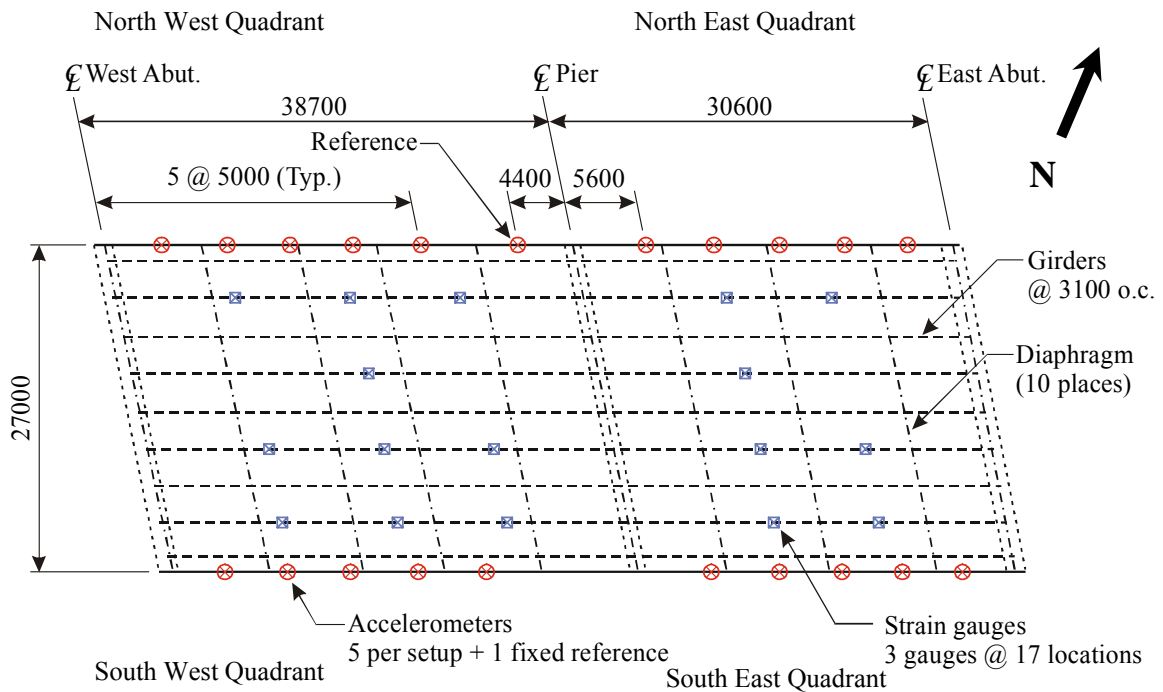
Plan View of the bridge deck, showing a schematic layout of the accelerometers and strain gauges (dimensions in mm).
